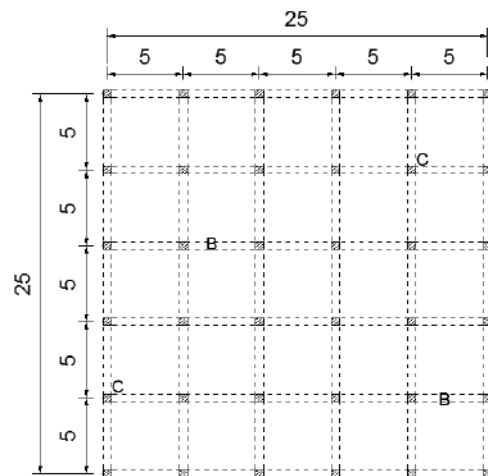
Typical floor plan of moment-resisting frame system (units in meter).
